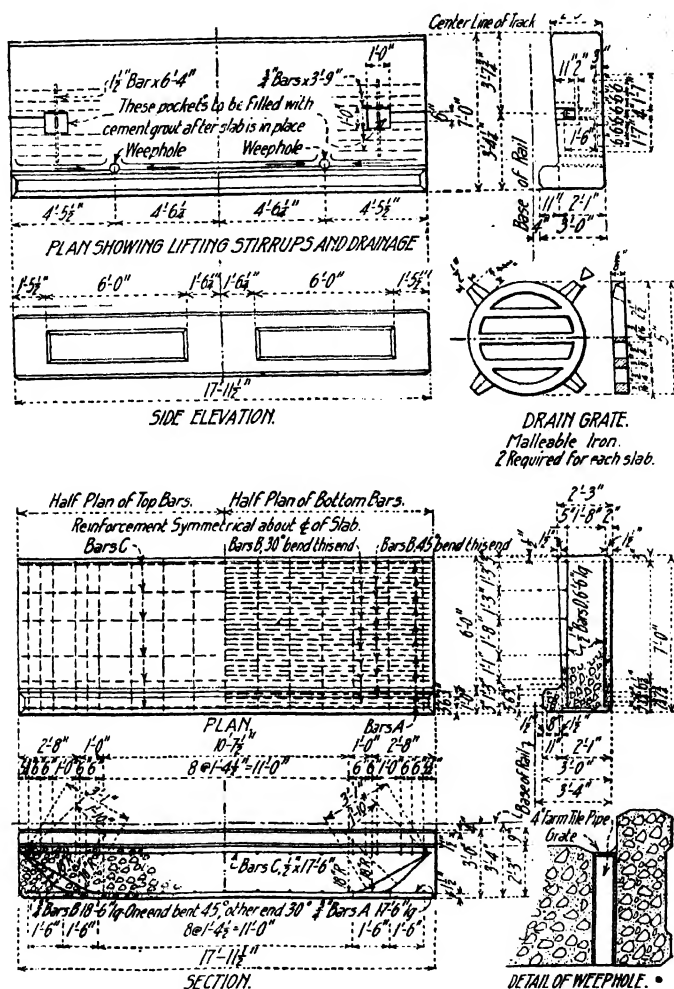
Reinforced concrete trestle slab of the Illinois Central R. R.
